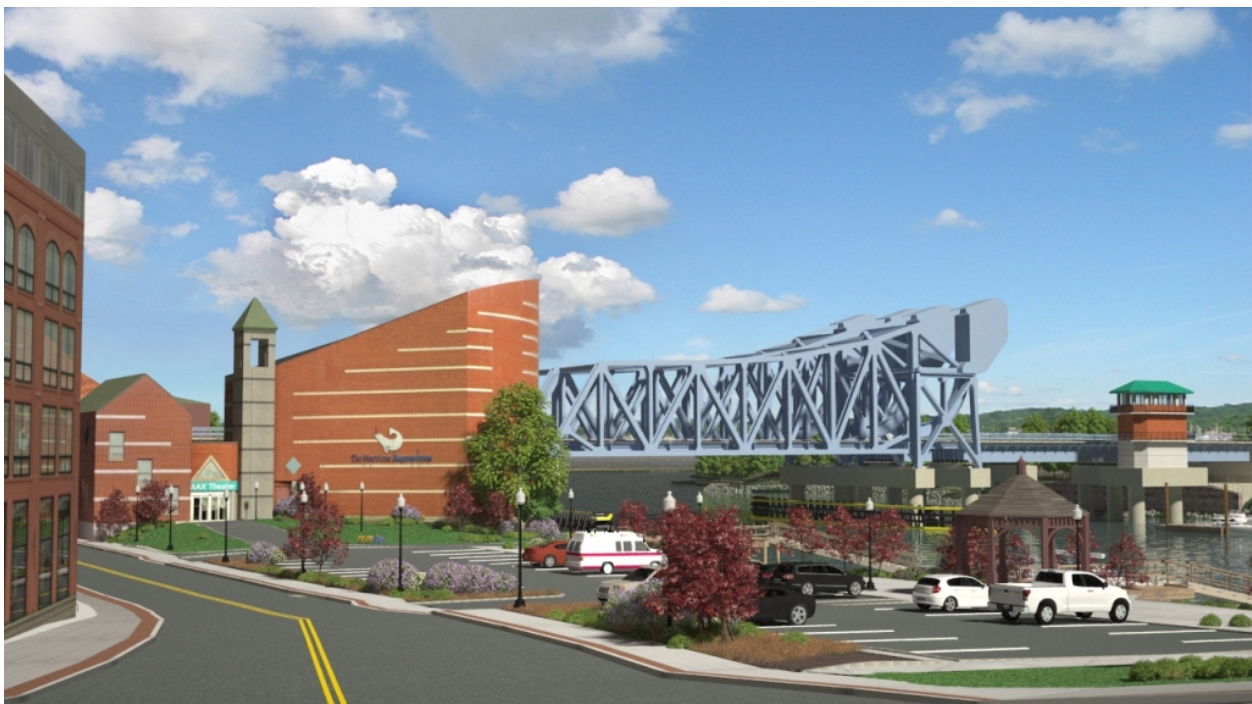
Rendering of the Short Span Vertical Lift Bridge (Option 8A) – View from the Southeast
